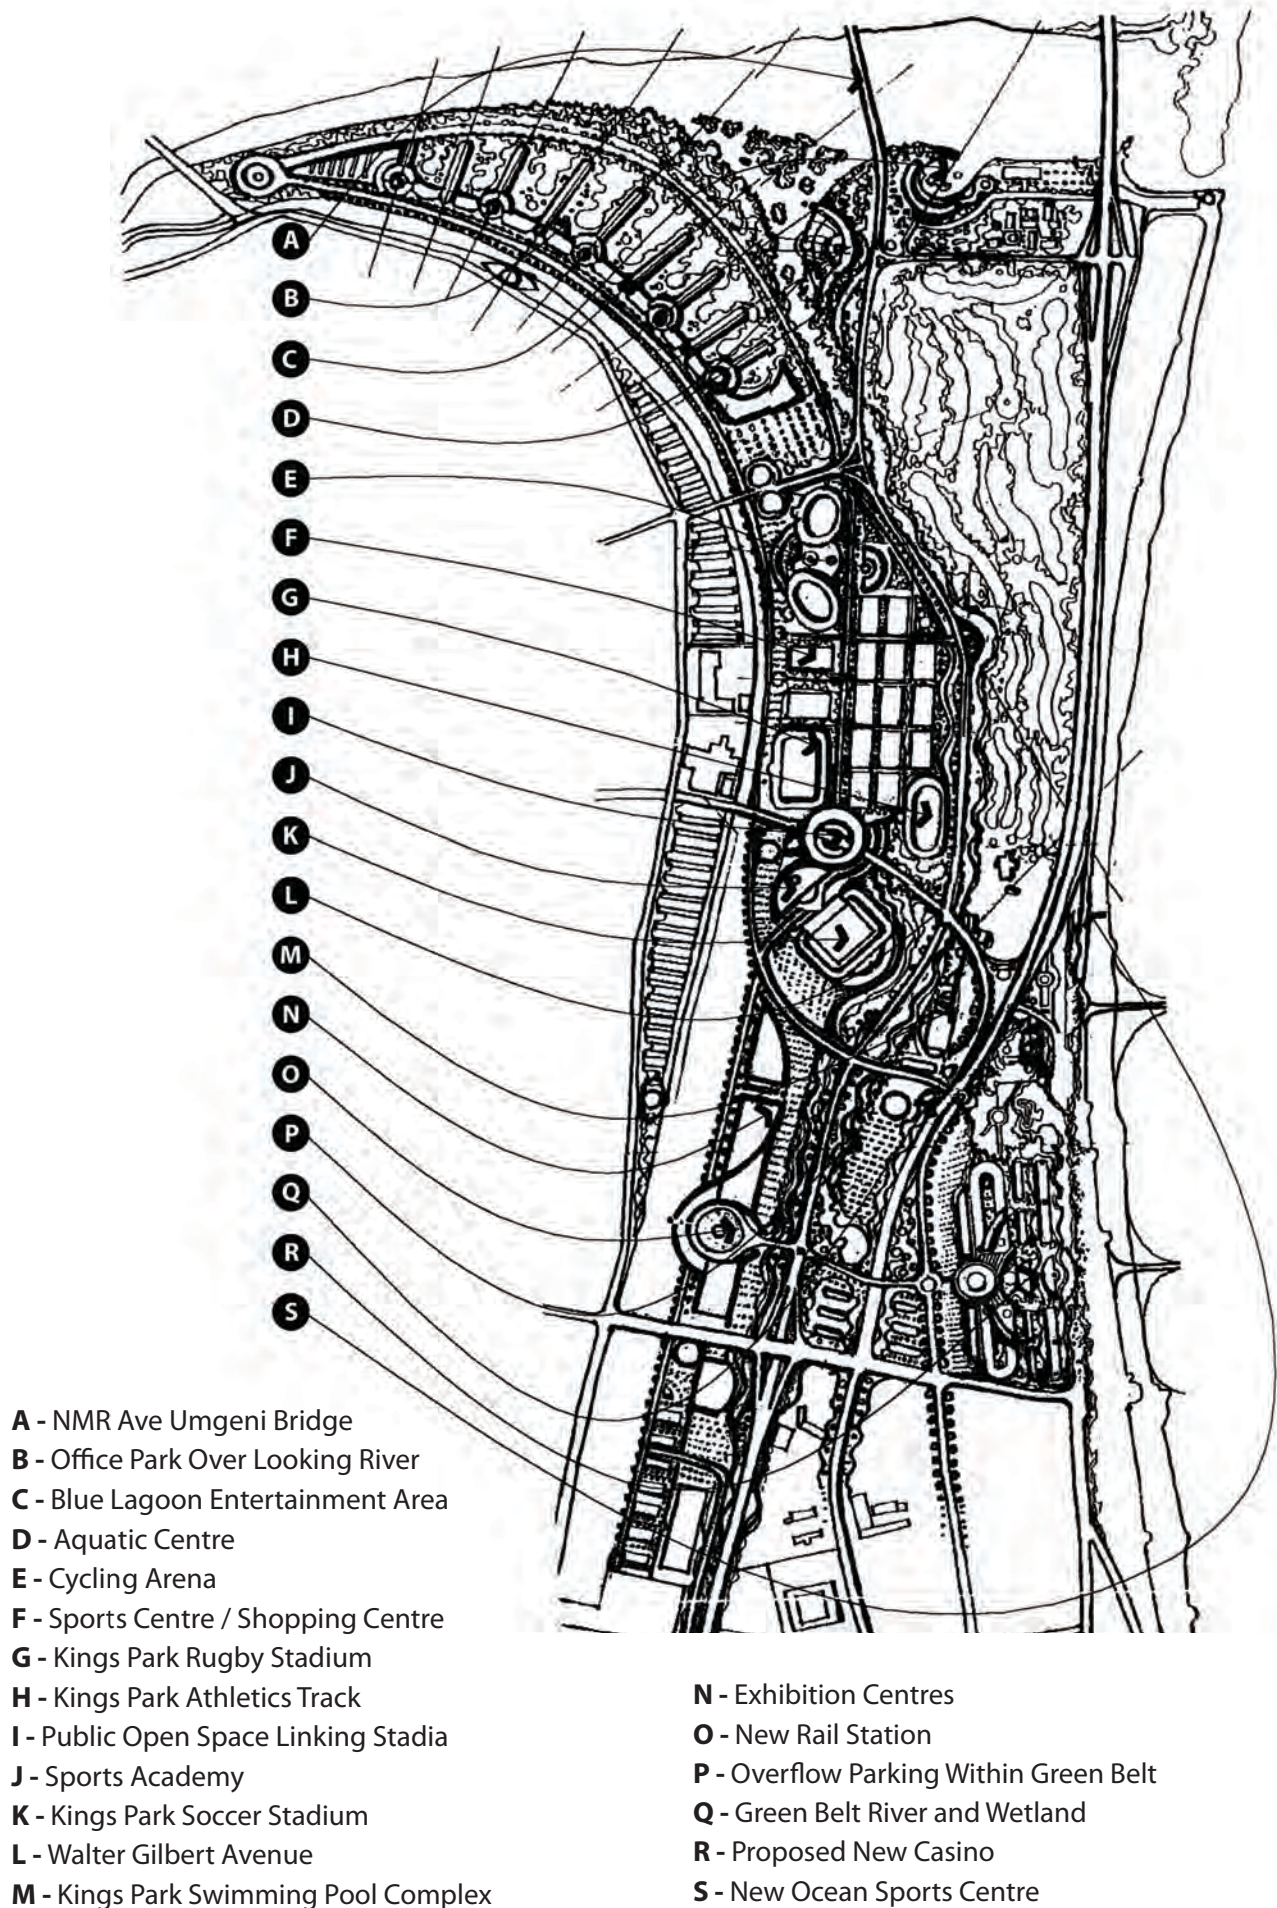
PROPOSED PLAN INDICATING VARIOUS FACILITIES AND NODES (FORD, 1999: 45).
